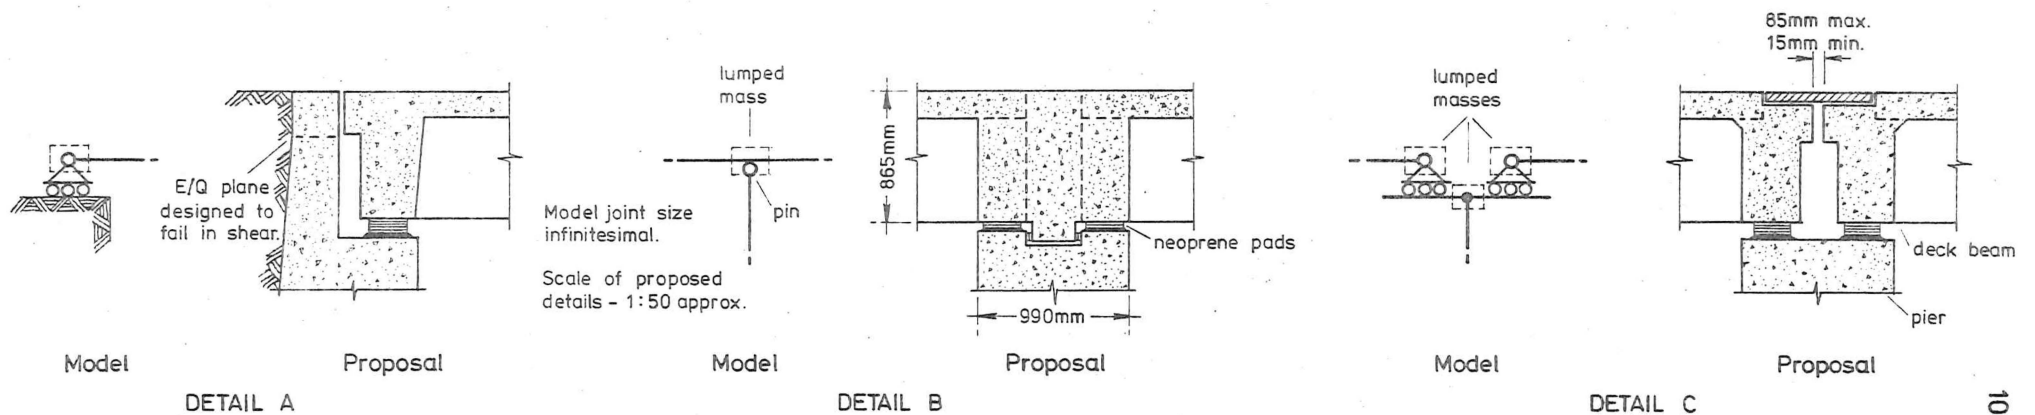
DURHAM STREET RAILWAY OVERBRIDGE, CHRISTCHURCH.
